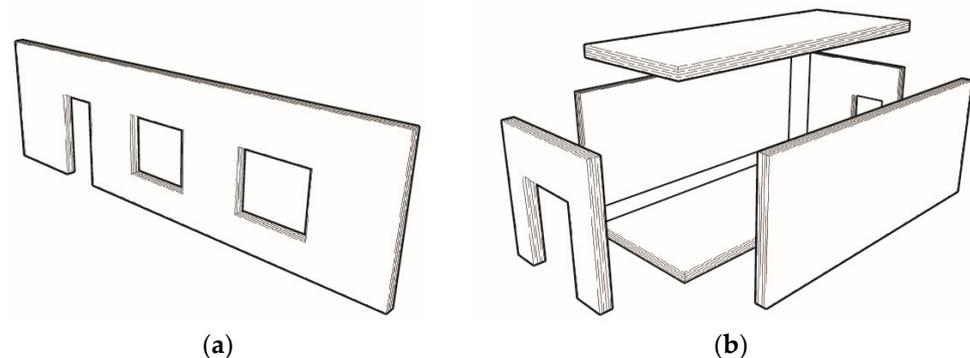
Prefabricated structure: (a) wall-panel construction (2D); (b) volumetric modular (3D) (source: author).
